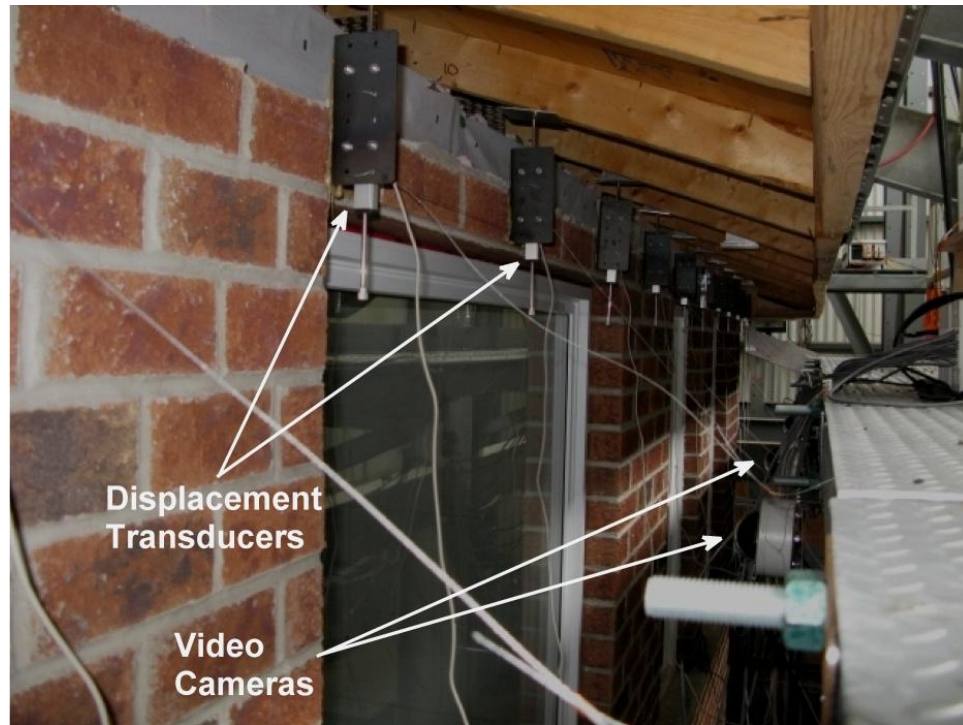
Photograph of the displacement transducers mounted on the brick veneer to measure the displacement of the roof to wall connections
